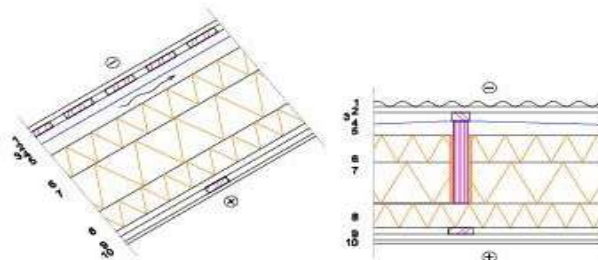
Section of ZEB's slab roof: 1 – roof cladding; 2 –solid deck; 3 – wood roll; 4 – anti-condensation membrane; 5 – ventilated gap ≥ 50 mm; 6 – ceiling supporting truss; 7 – slabs SPU AL 150+100 mm (the outer layer); 8 – slabs SPU AL 40 mm (internal continuous layer); 9 –space for laying of engineering communications; 10 – interior finishing layer.
